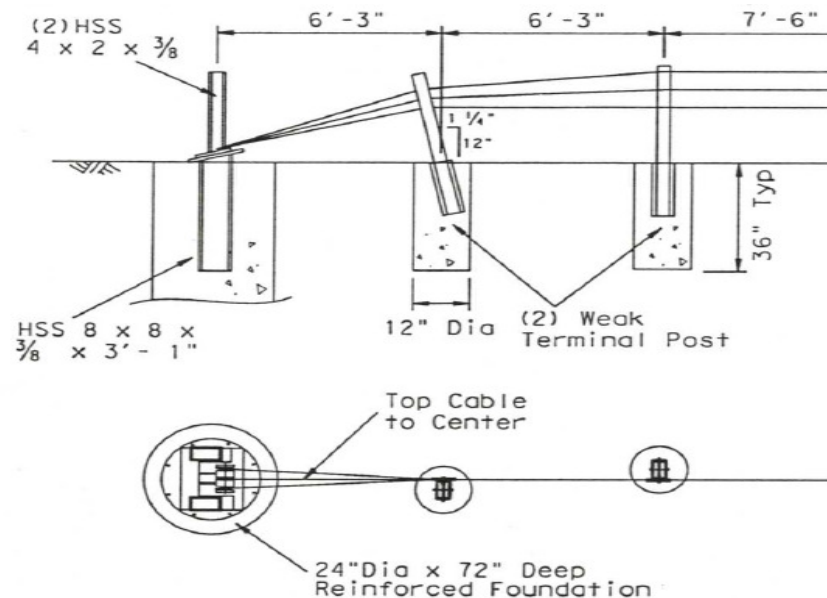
Connection Details of Cables to Drilled Shafts for the Gibraltar TL-3 Barrier System
